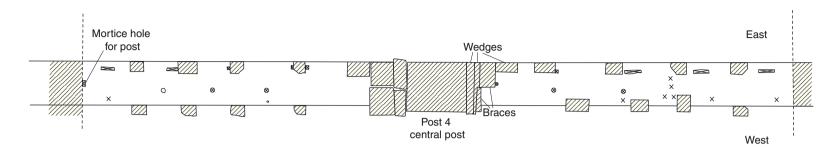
Elevation and plan of late 17thC timber structure dividing Royal and winter pews (North facing elevation)
